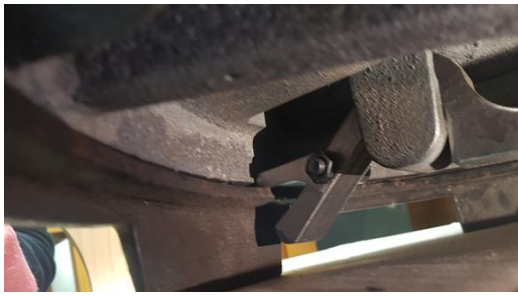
Position of the lifting device and the manhole frame at the end of lifting experiment
